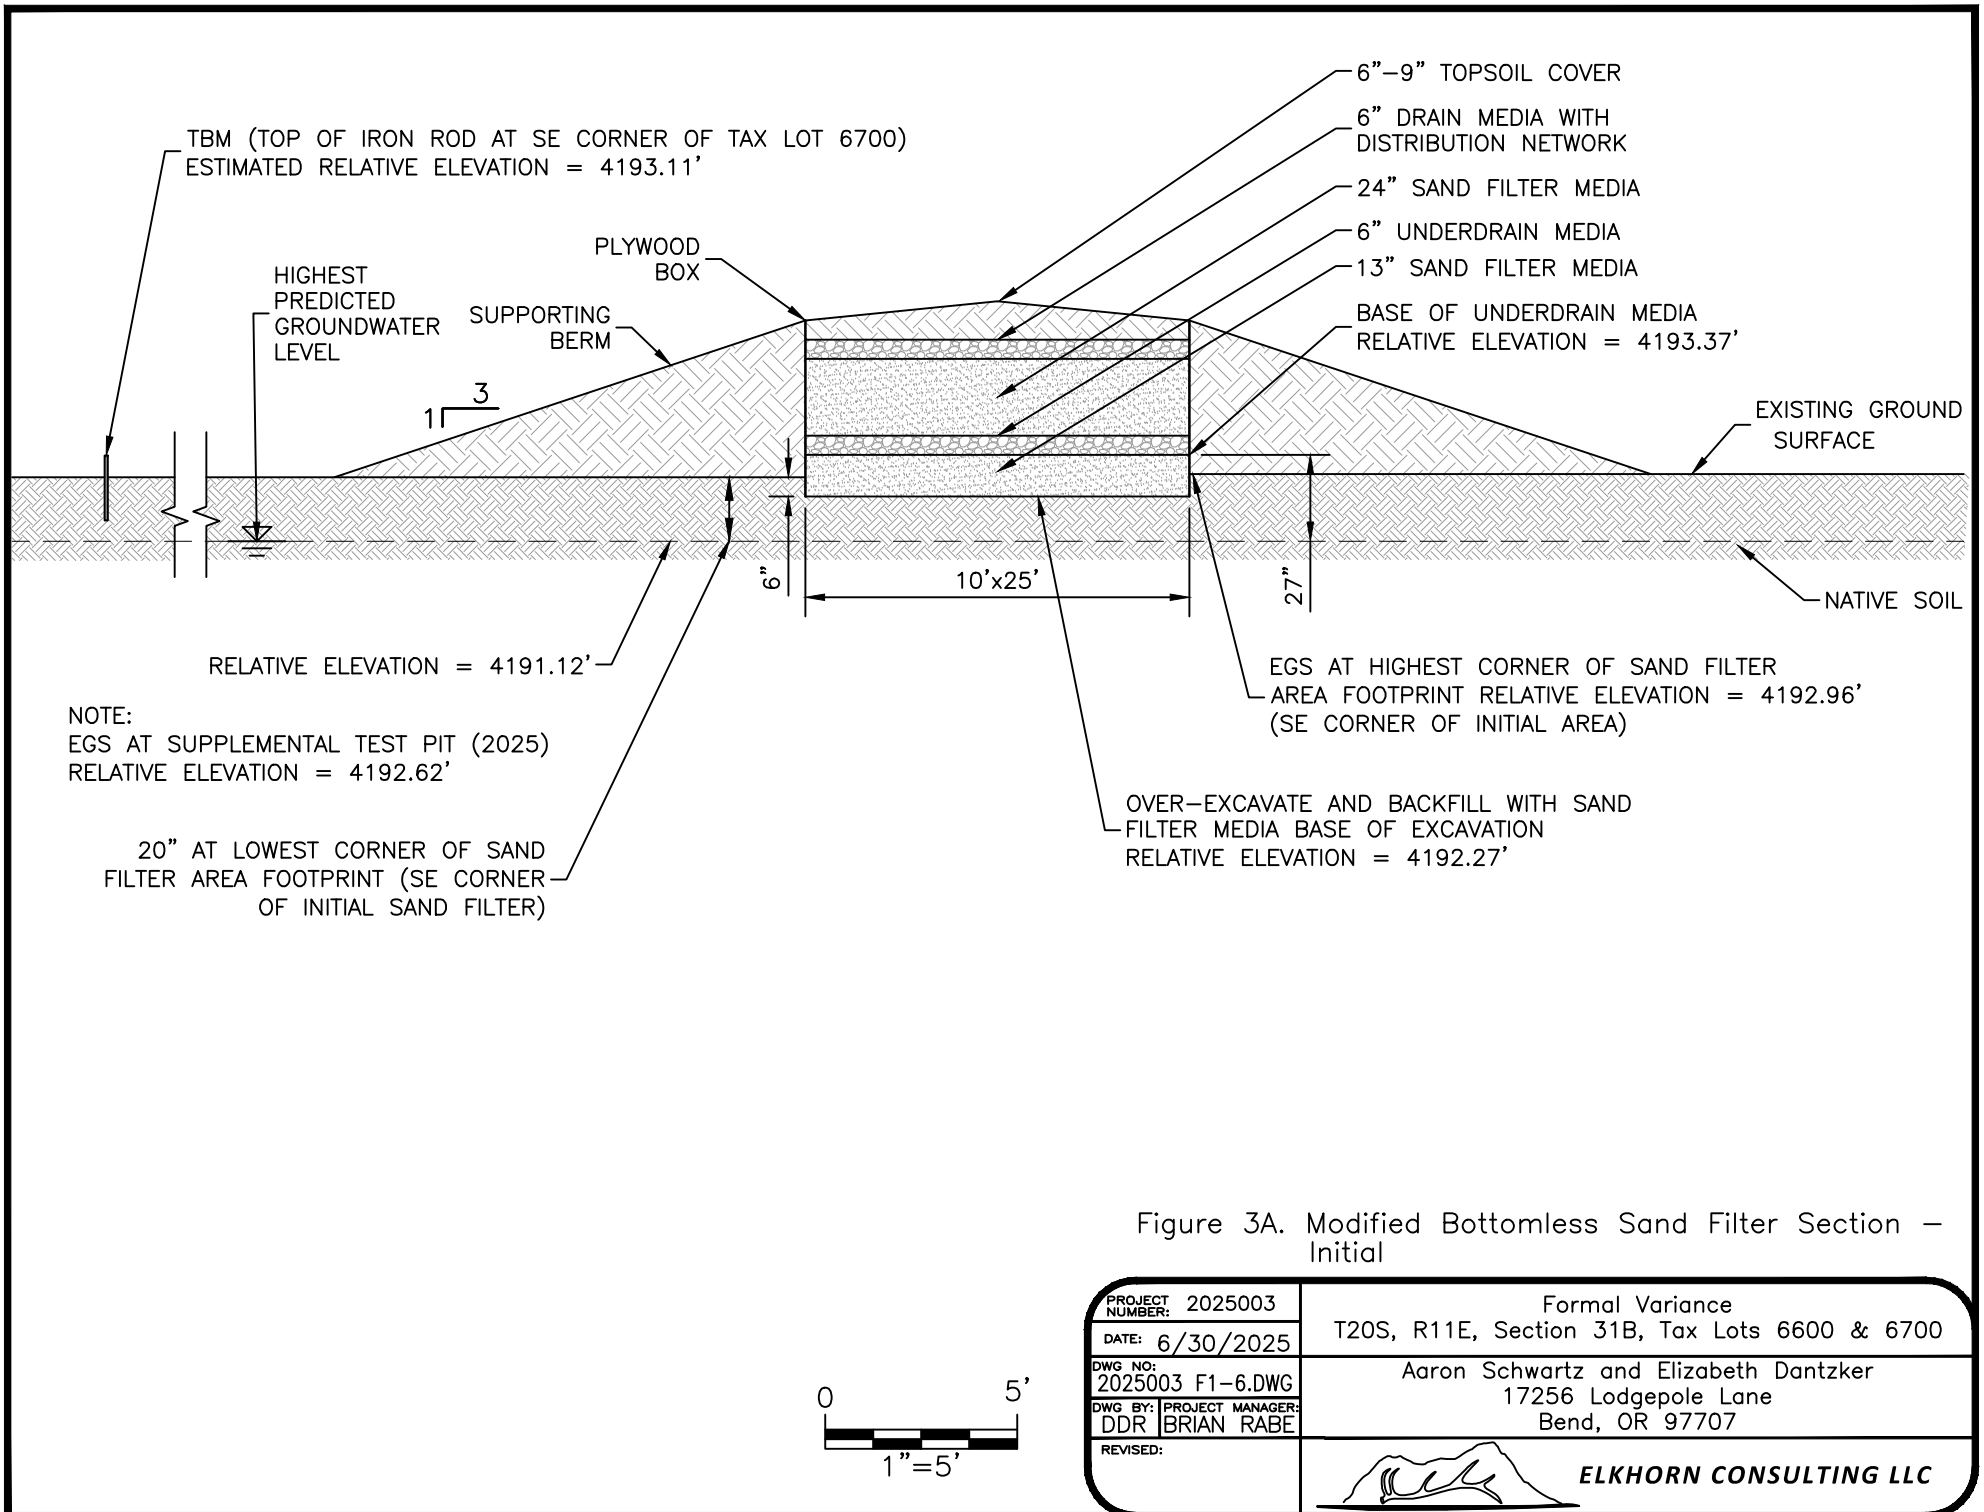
A. Modified Bottomless Sand Filter Section – Initial
